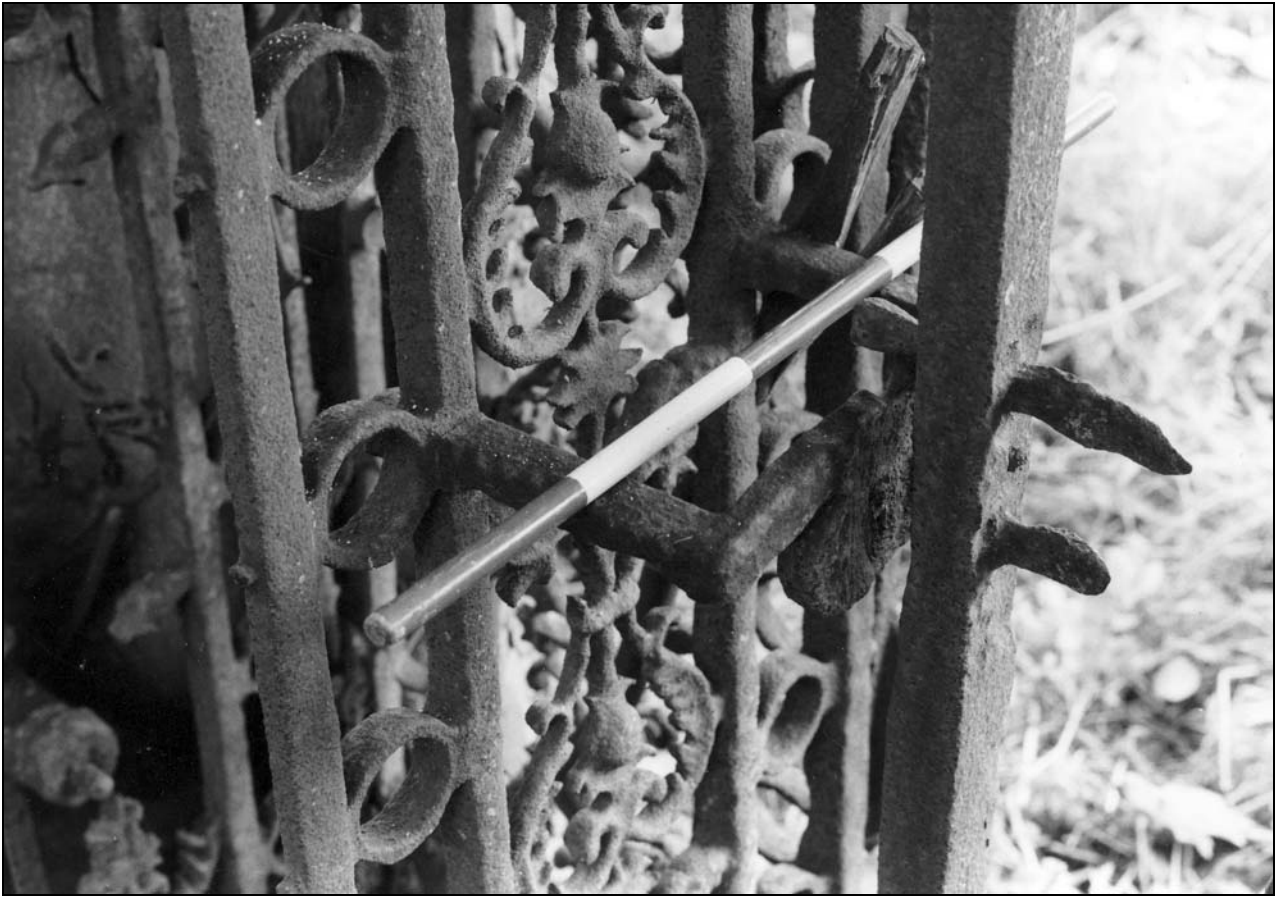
Detail of gate latch, looking north-east (film 2, frame 6)
